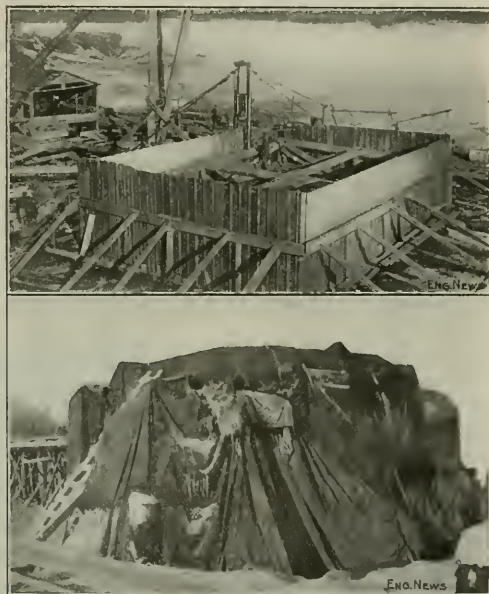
SUBSTRUCTURE WORK ON THE FOURTH CROSSING BRIDGE
